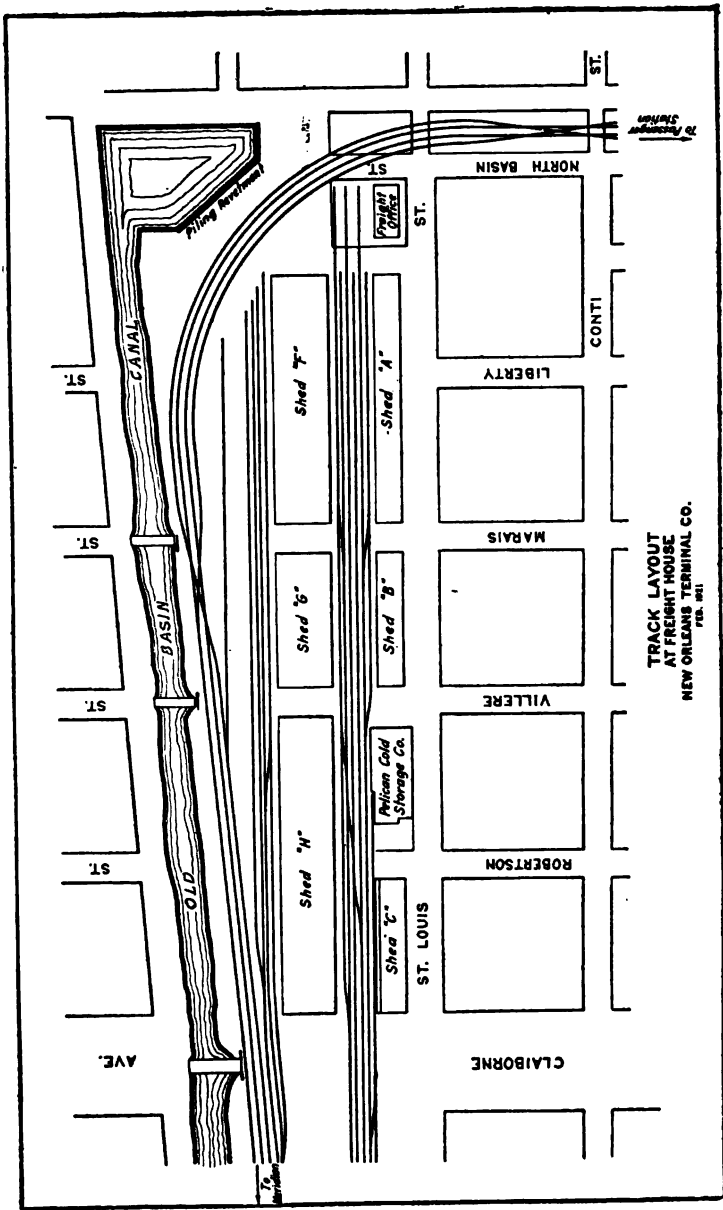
TRACK LAYOUT AT FREIGHT HOUSE.
